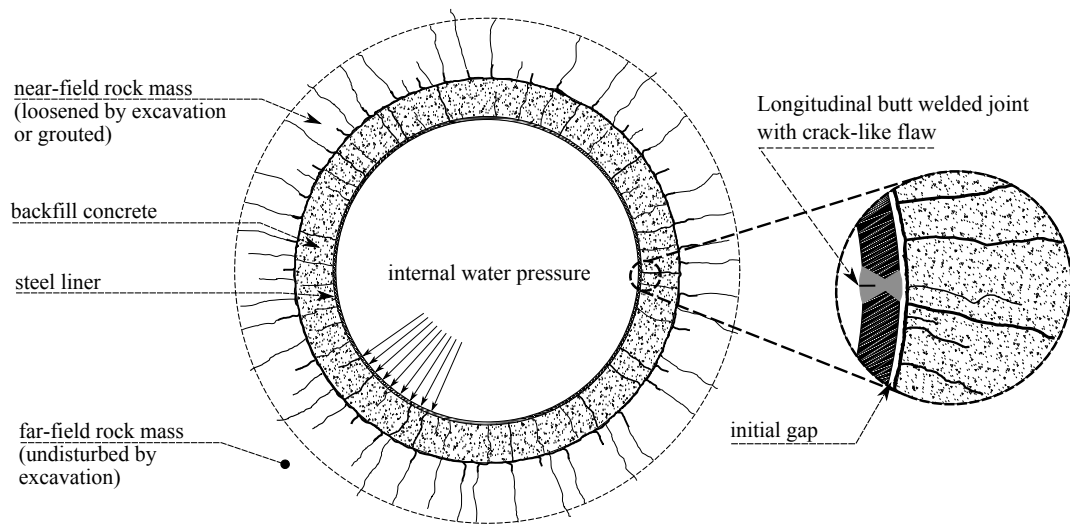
Definition sketch of the standard multilayer system for SLPT&S. The longitudinal butt welded joint is emphasized in the upper right corner, with an axial surface crack in the weld material.
